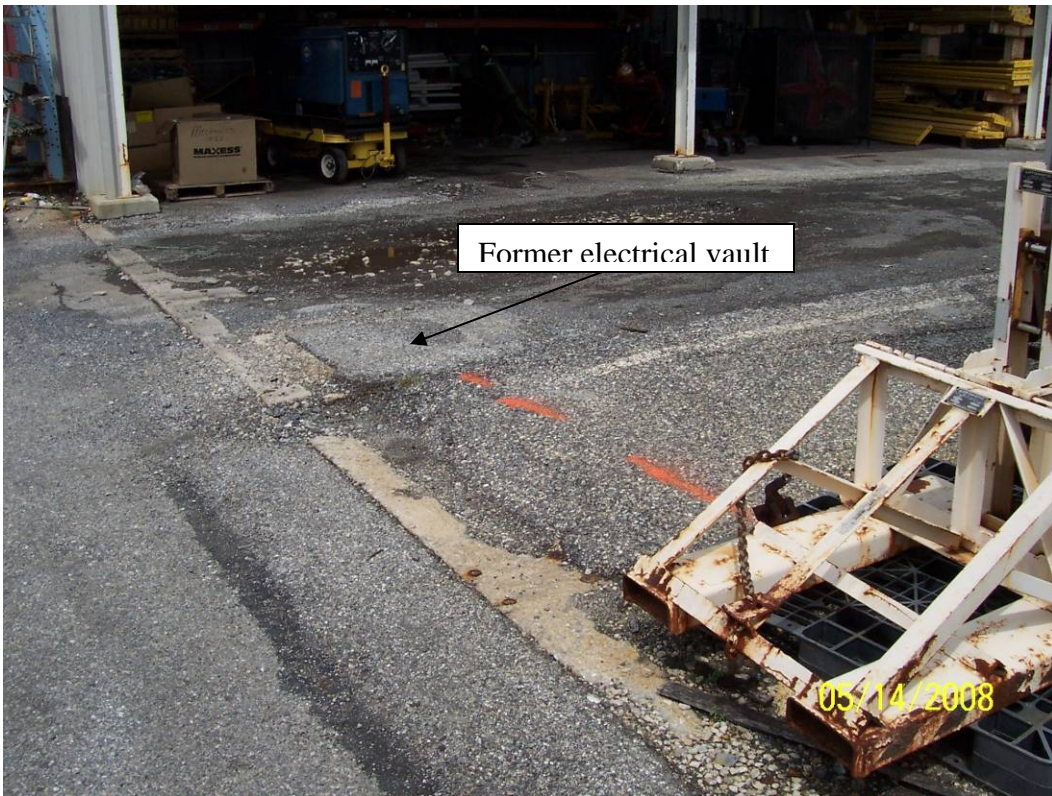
View of location of presumed former electrical vault west of Building 51. An electrical conduit from Pit #3 was traced to this location. View facing west.
